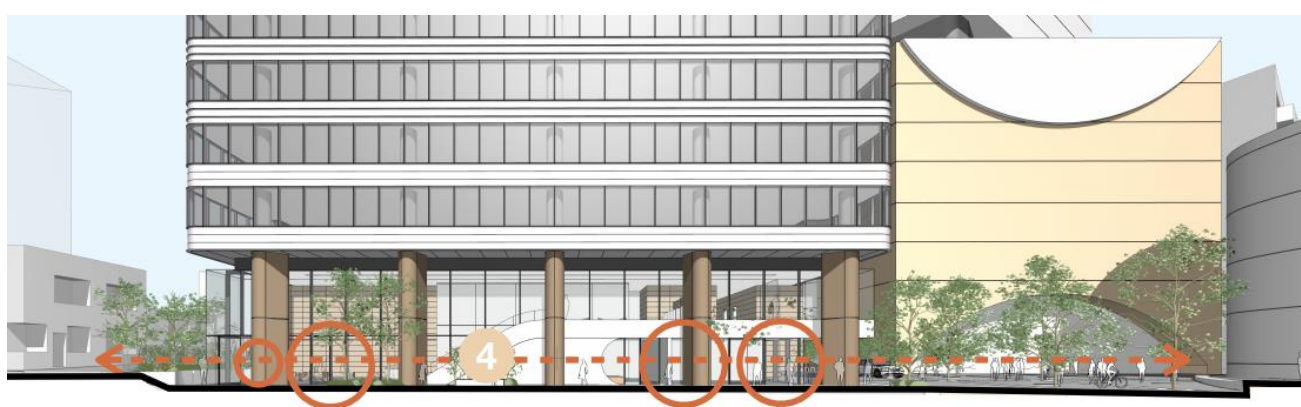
East-west pedestrian laneway providing a connection to Phase A
